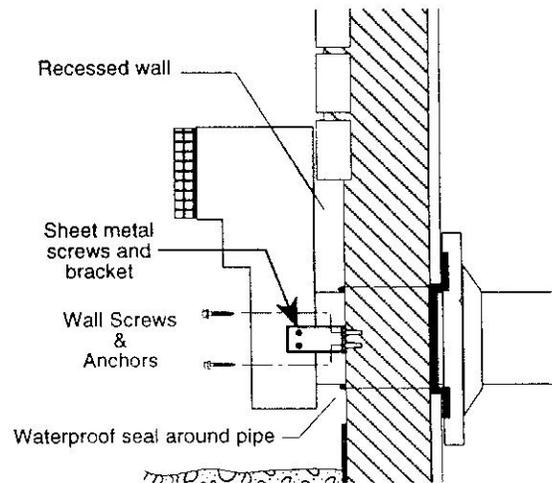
Use extension brackets to mount snorkel against recessed wall.
